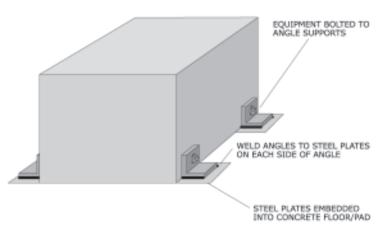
Four or more angles on each side of equipment welded to embedded plates. Figure 150 (page 119) gives examples of embedded steel plates.
